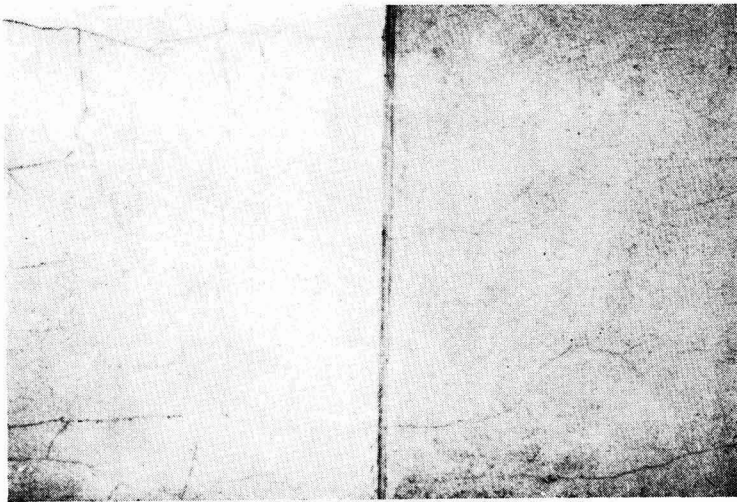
Test wall, sections 1 and 2, south aspect showing crazing at 3½ years
